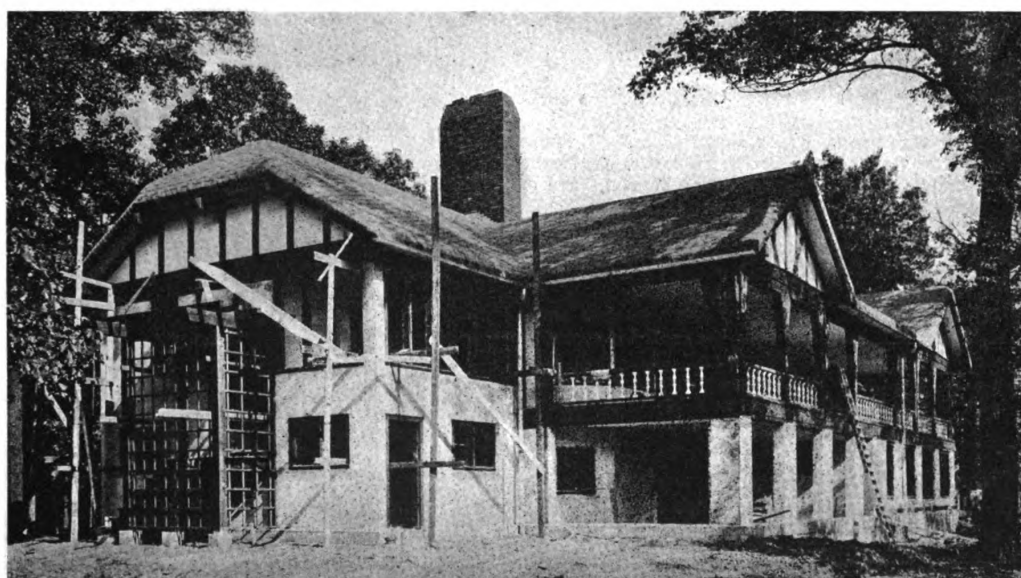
Exterior View of the North Shore Golf Club in Chicago and Roofed with Rex Wide Space Asphalt Shingles
